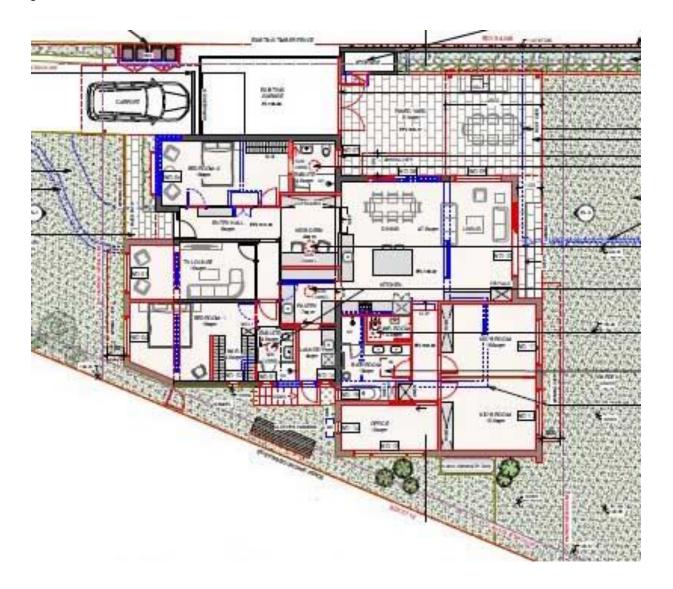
Proposed Alterations and Additions (Drawing DA 10)
